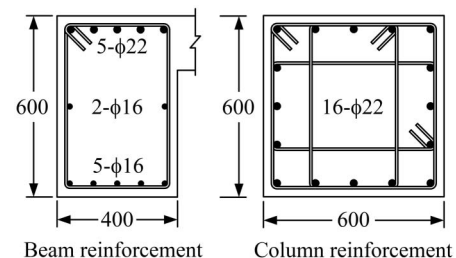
Longitudinal reinforcement details and cross-sectional dimensions of the beams and columns (all dimensions and rebar diameters in millimeters)
